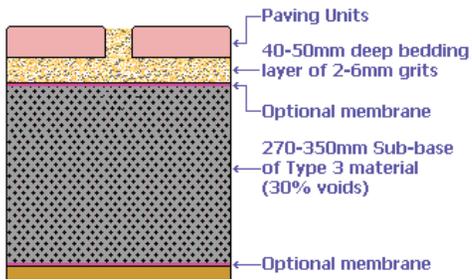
Detail of a typical porous paving system that can be incorporated into the crosswalk and sidewalk at the intersection of highway 54 and Main St. (Porous Paving System)
